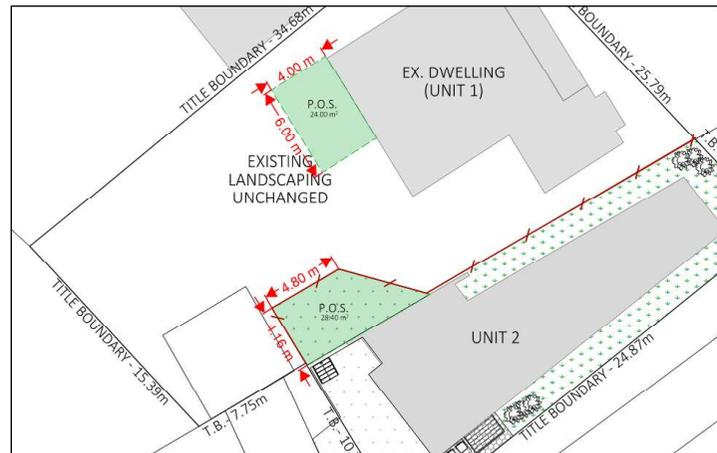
excerpt of the Site Plan illustrating the area of each dwelling used to calculate the area of private open space required by clause 8.4.3 A2 of the Scheme.
